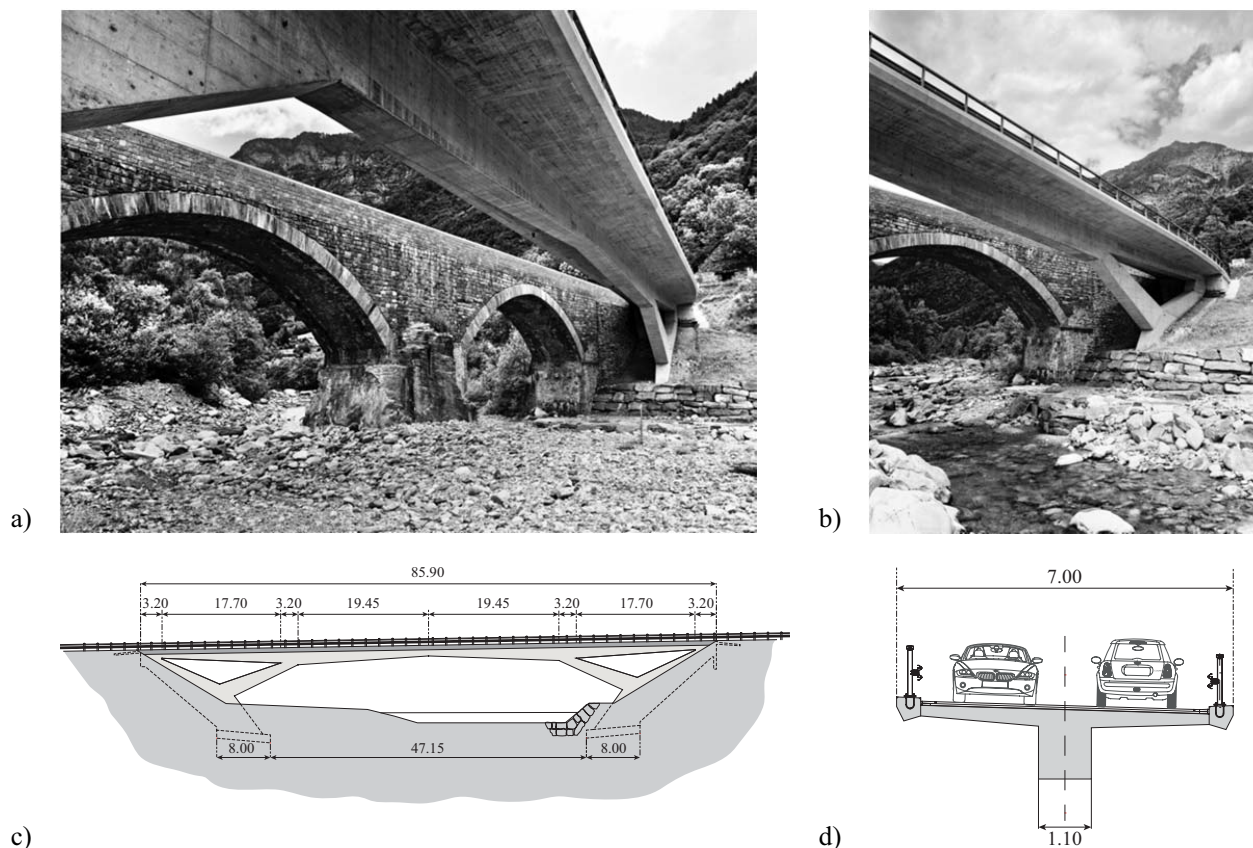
Bridge over the Verzasca river: (a,b) view of the new and old bridges; (c) horizontal view; and (d) cross-section of the bridge (adapted from [14])
